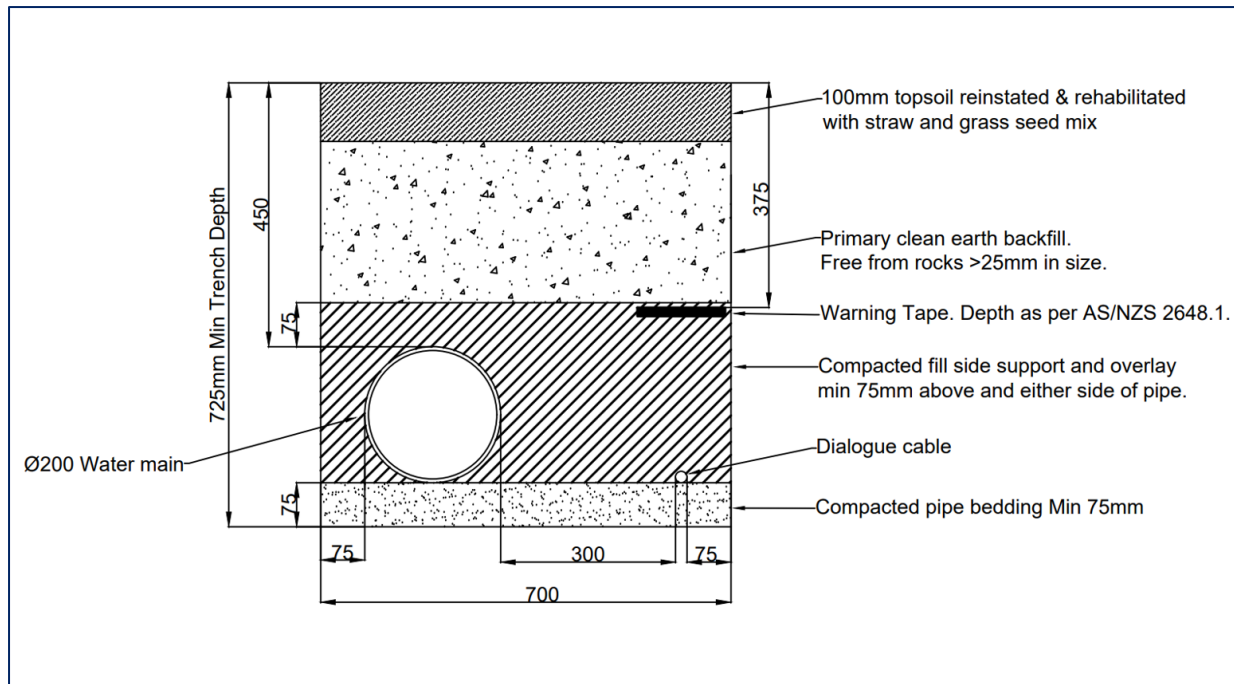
| Cross section identifying trenching details (Source: Applicant's SEE 2024)
